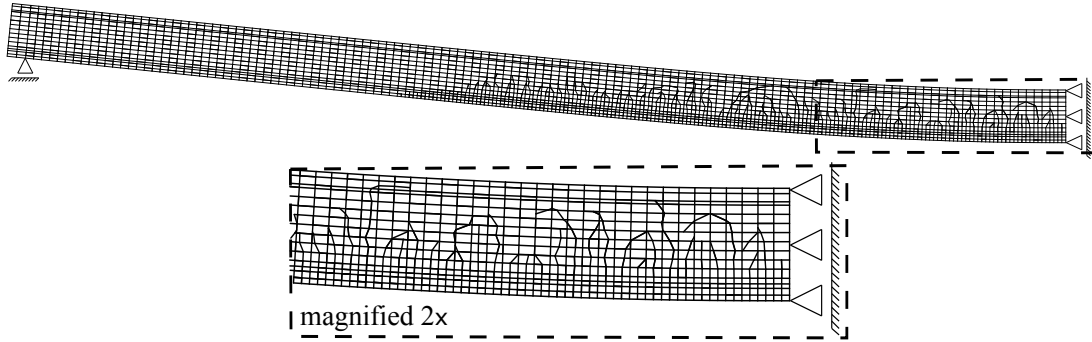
Deformed shape and crack pattern at failure of non-strengthened girder.
